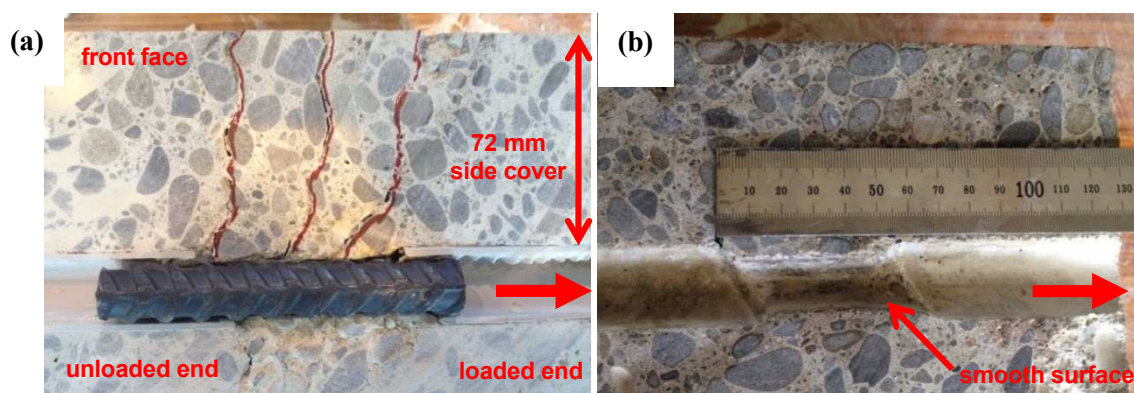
Saw-cut cross sections showing the typical damage after: (a) splitting failure, and; (b) pull-out failure.
